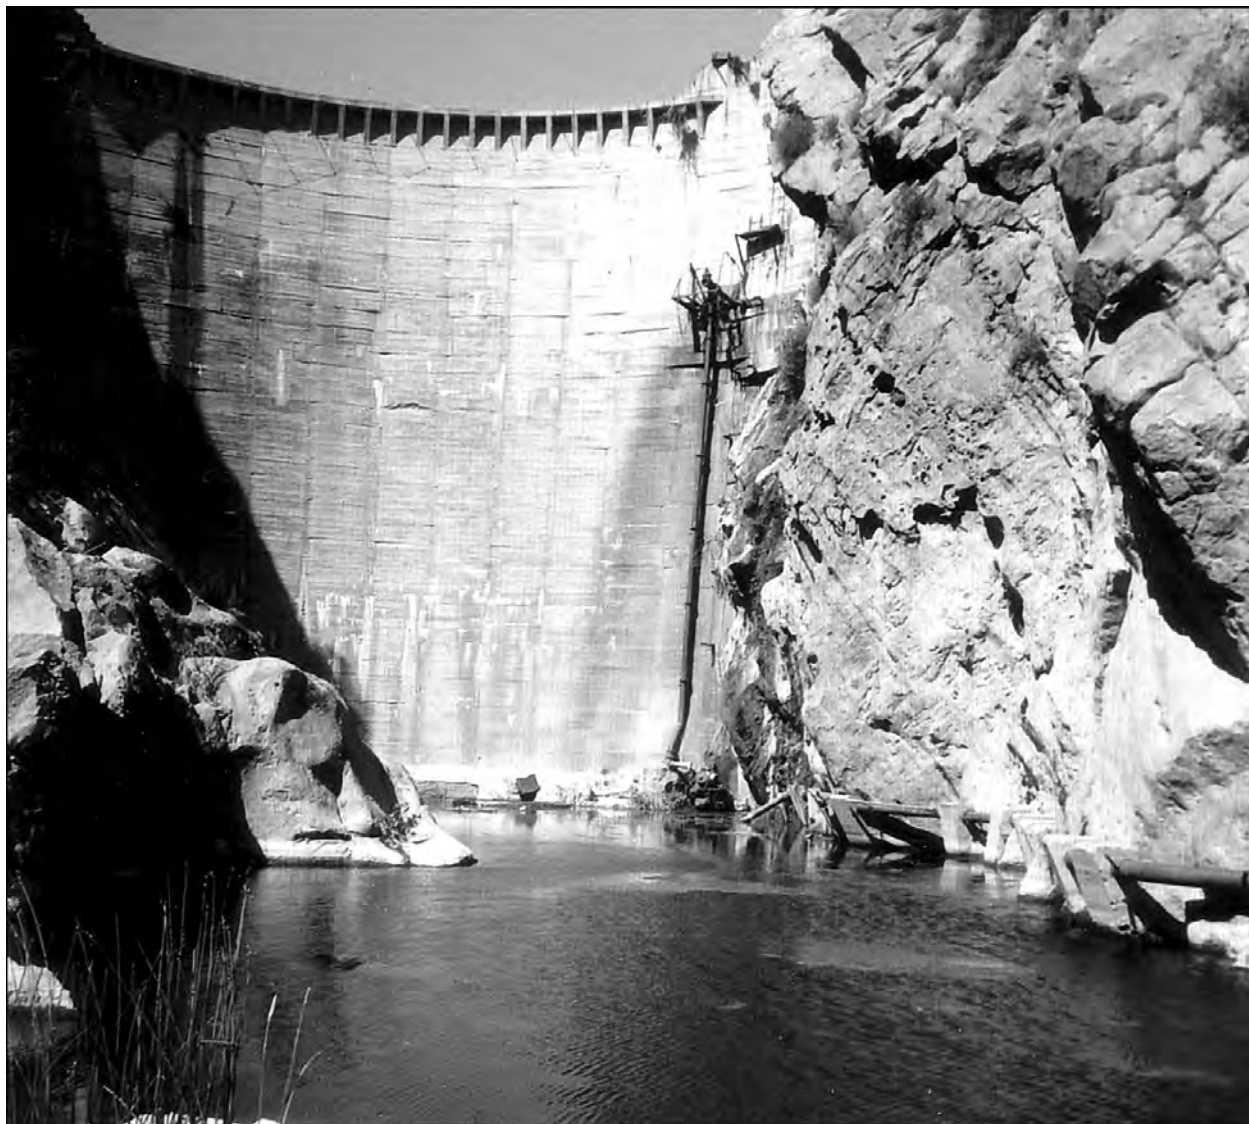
Dam wall, viewed north from Malibu Creek, 1966. The 8-inch distribution line can be seen exiting the dam roughly one-third down from the top. At the base of the dam, this connects to the horizontal distribution pipe attached to the canyon wall (Mario Quiros photograph, courtesy of Louis T. Busch).
